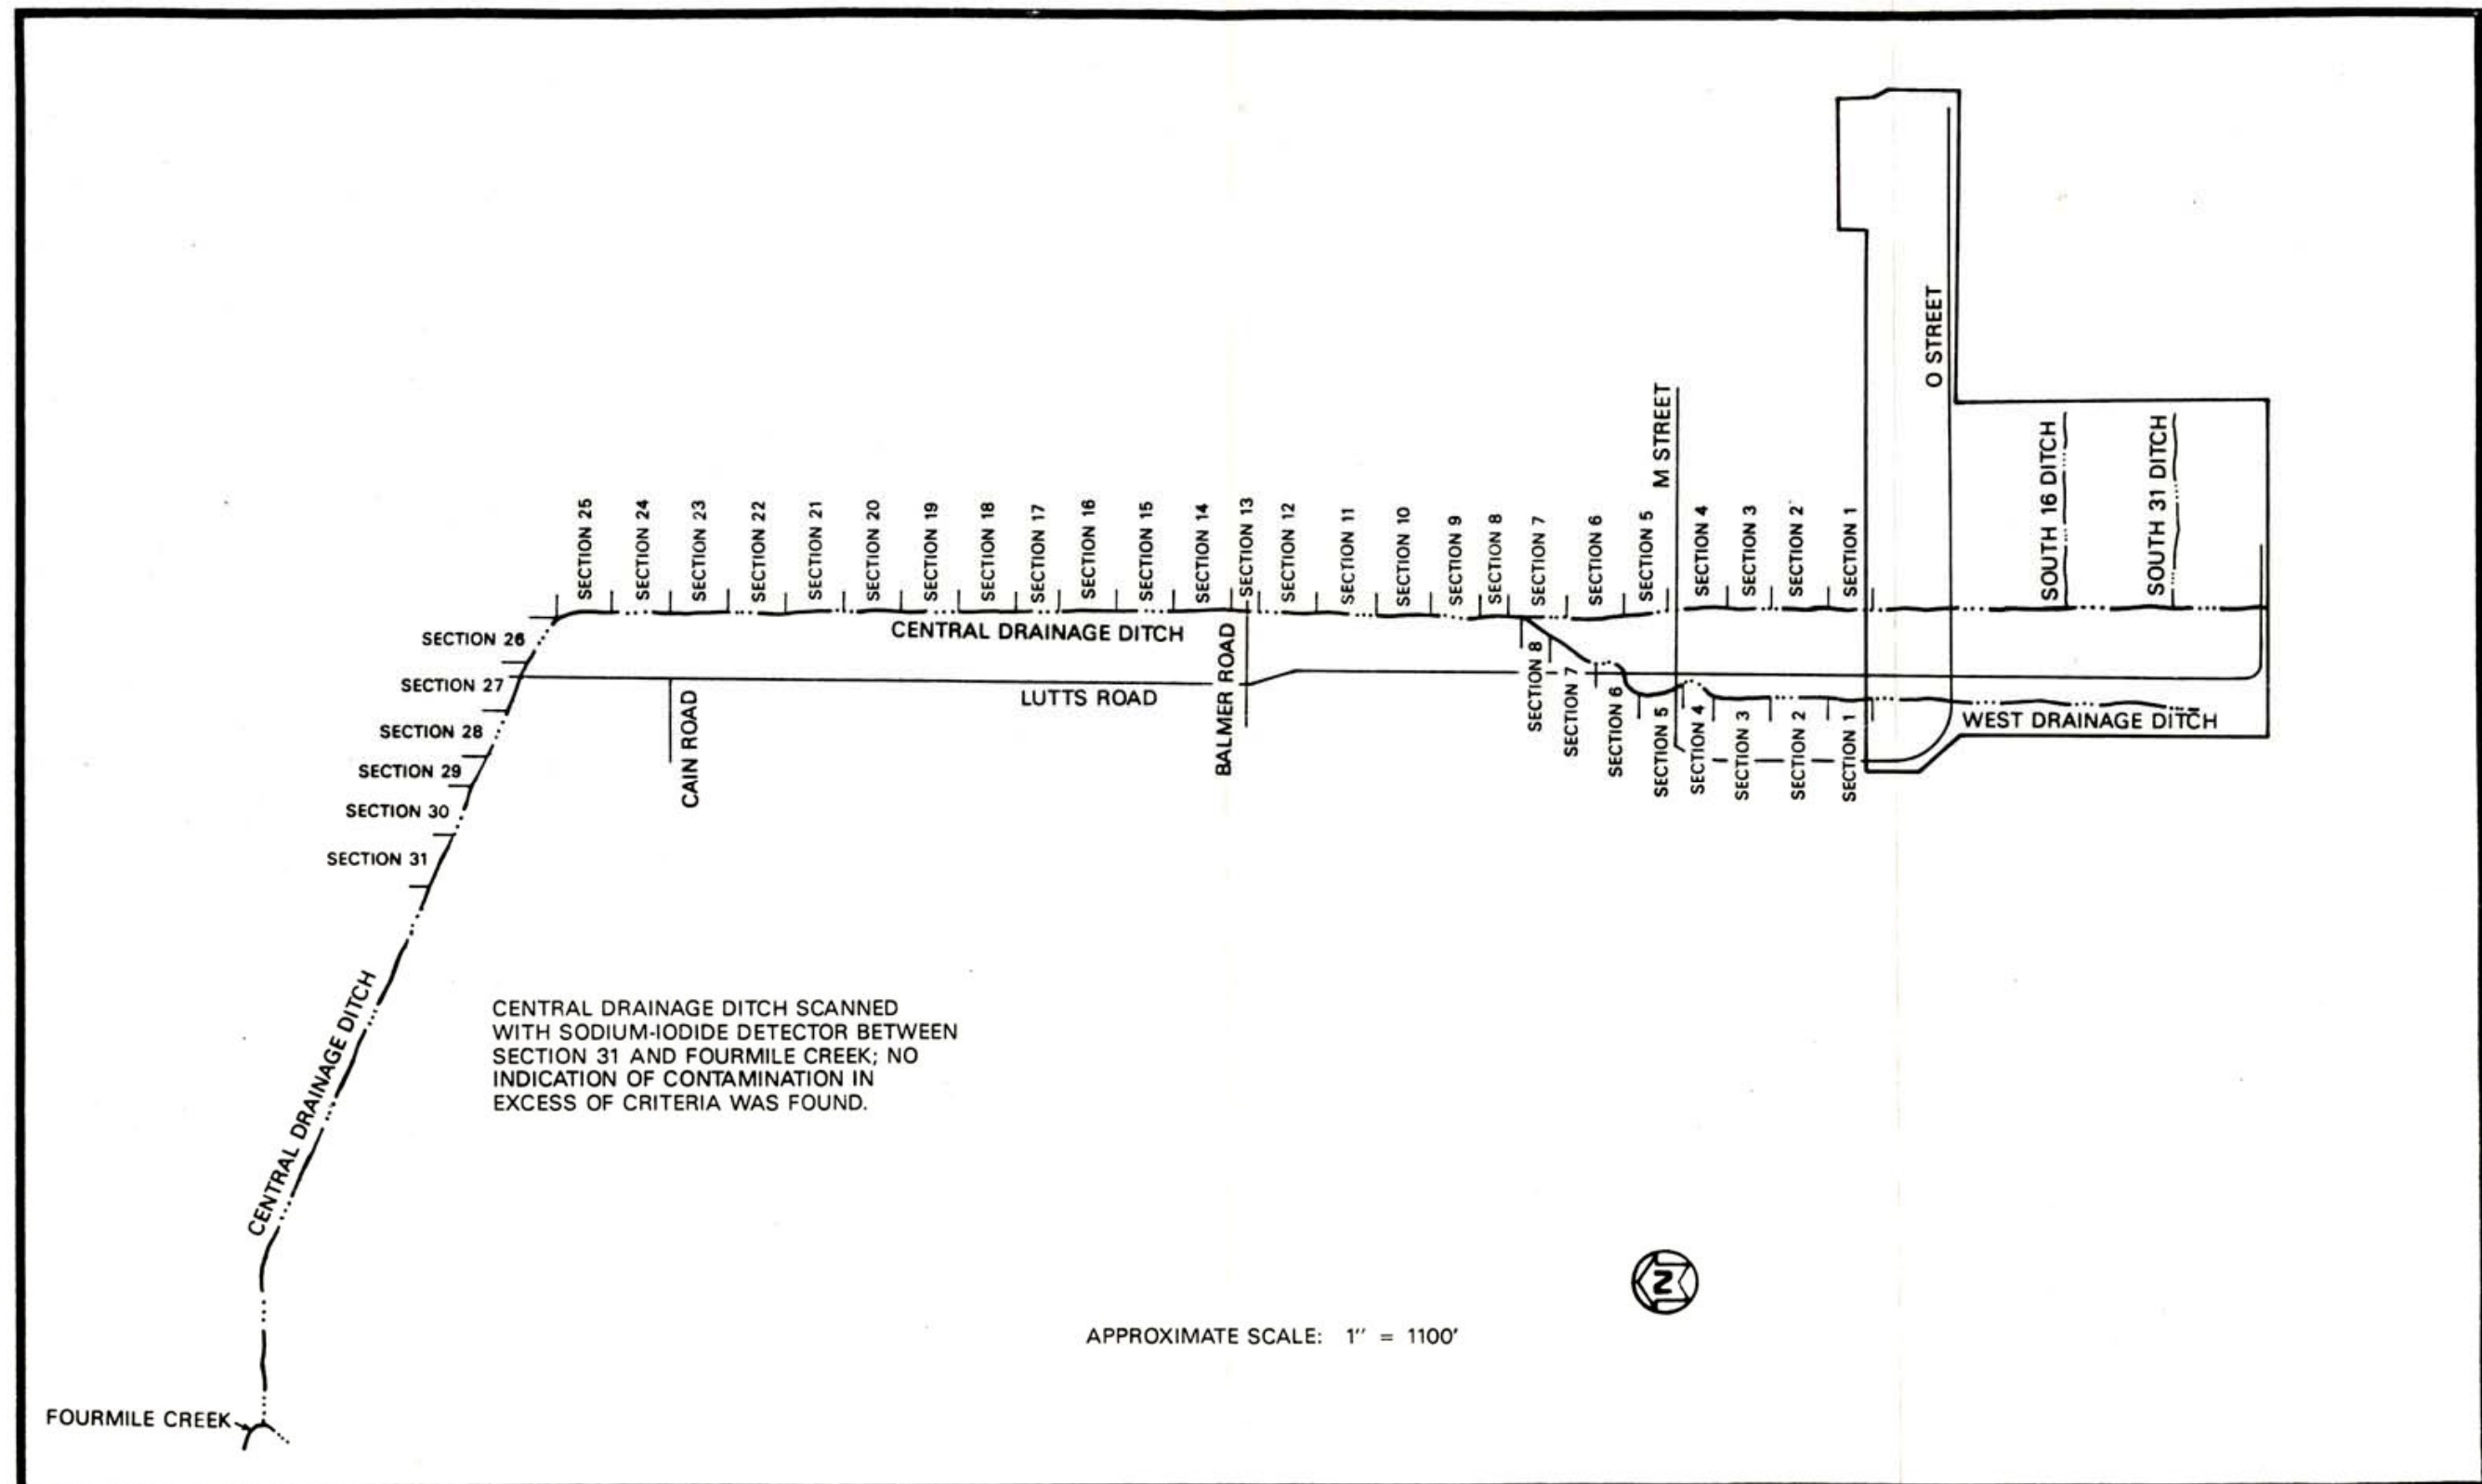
LOCATION AND REFERENCE DRAWING FOR THE WEST AND CENTRAL DRAINAGE DITCH EXCAVATIONS
